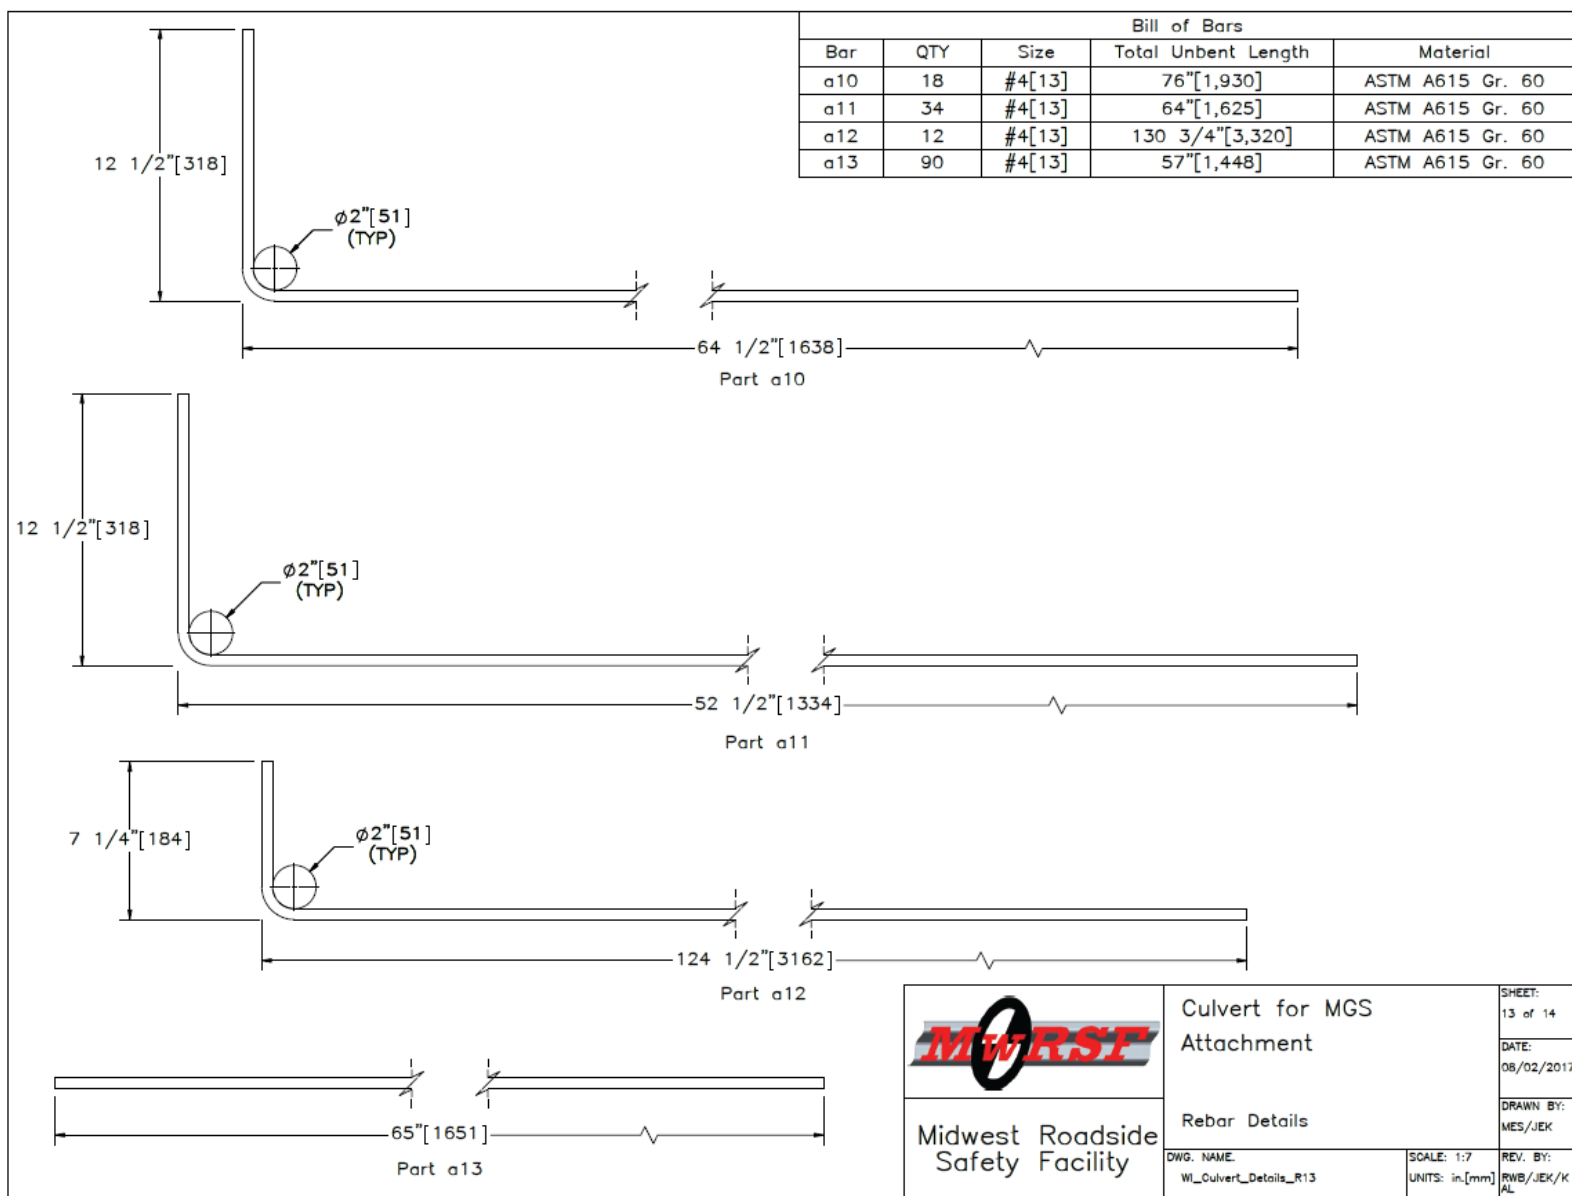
Rebar Details (Cont.), Test Nos. CMGS-1 and CMGS-2
